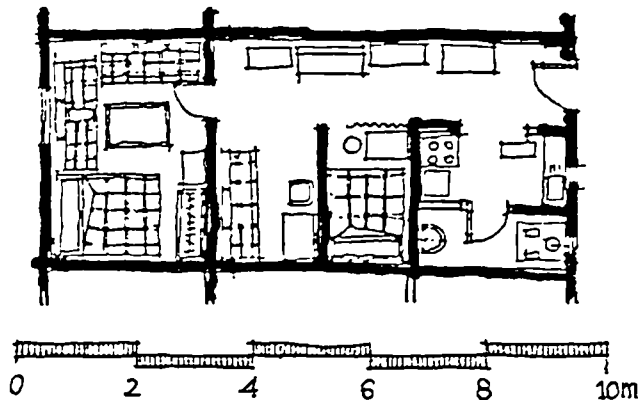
The plan of Foad's housing unit. No extension was built, only a partition wall was built to divide the living room into two spaces.
